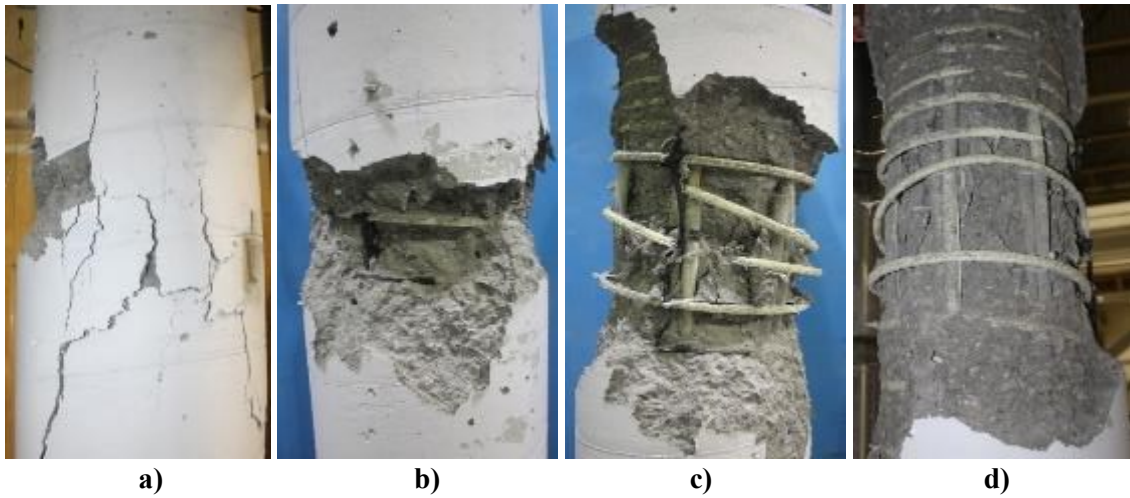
Typical failure mode: (a) concrete-cover spalling, (b) concrete crushing, (c) rupture of GFRP stirrups, and (d) GFRP-bar buckling.
